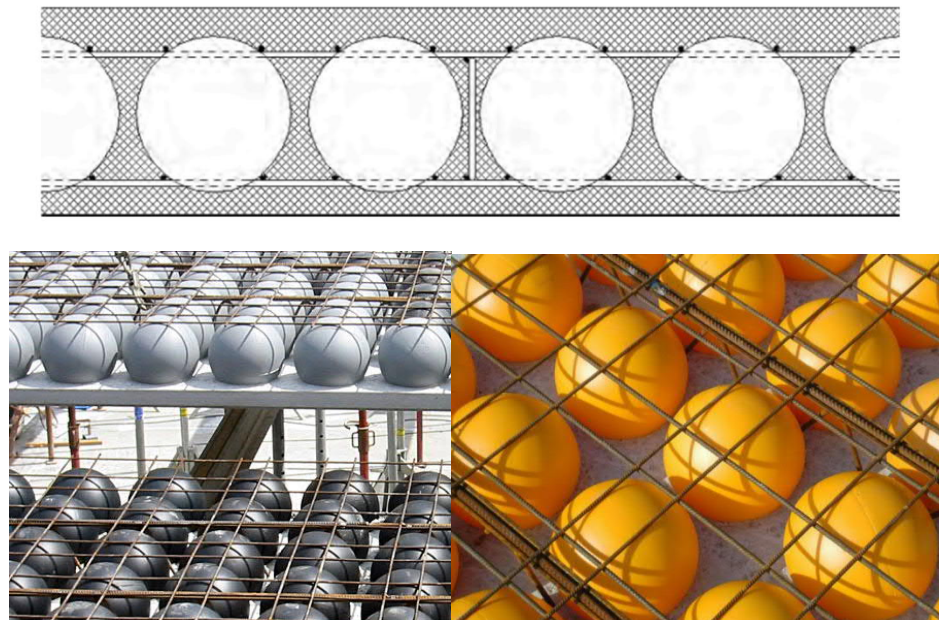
Bubble deck: cross section (top); precast planks (bottom); (BubbleDeck International A/S, n.d.)
